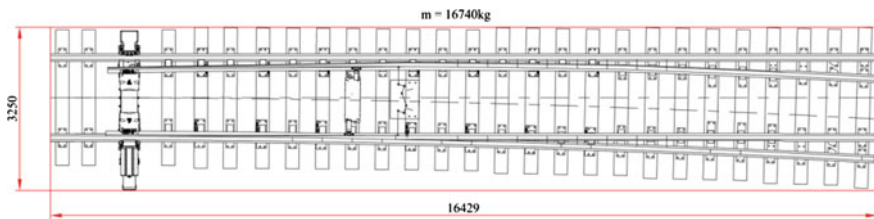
Point assembly (switch R65-300-1:11, drawing no. E14-006/2, Voestalpine VAE Legetecha UAB)
